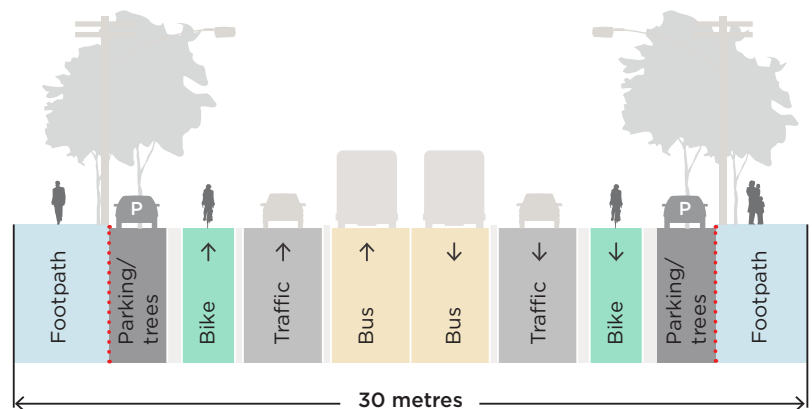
Potential typical street section for Spencer Street in the medium term.
